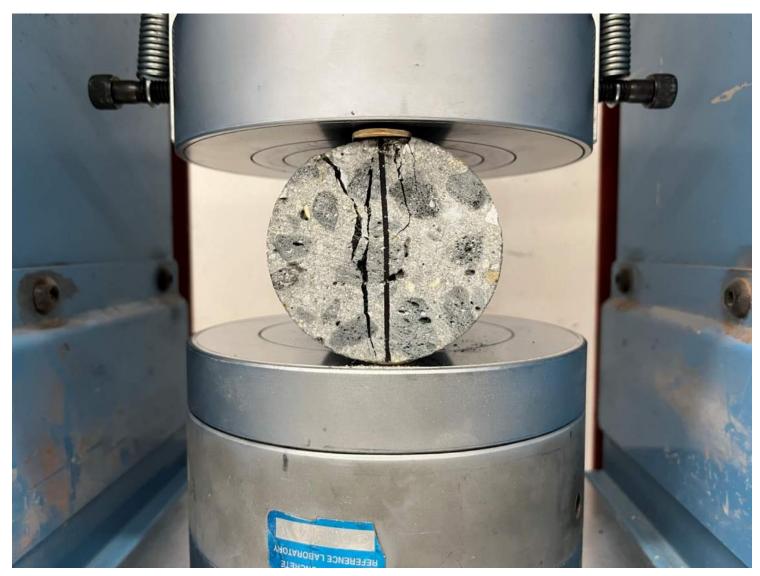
Split tension testing of specimen 4D-1 after peak load.
